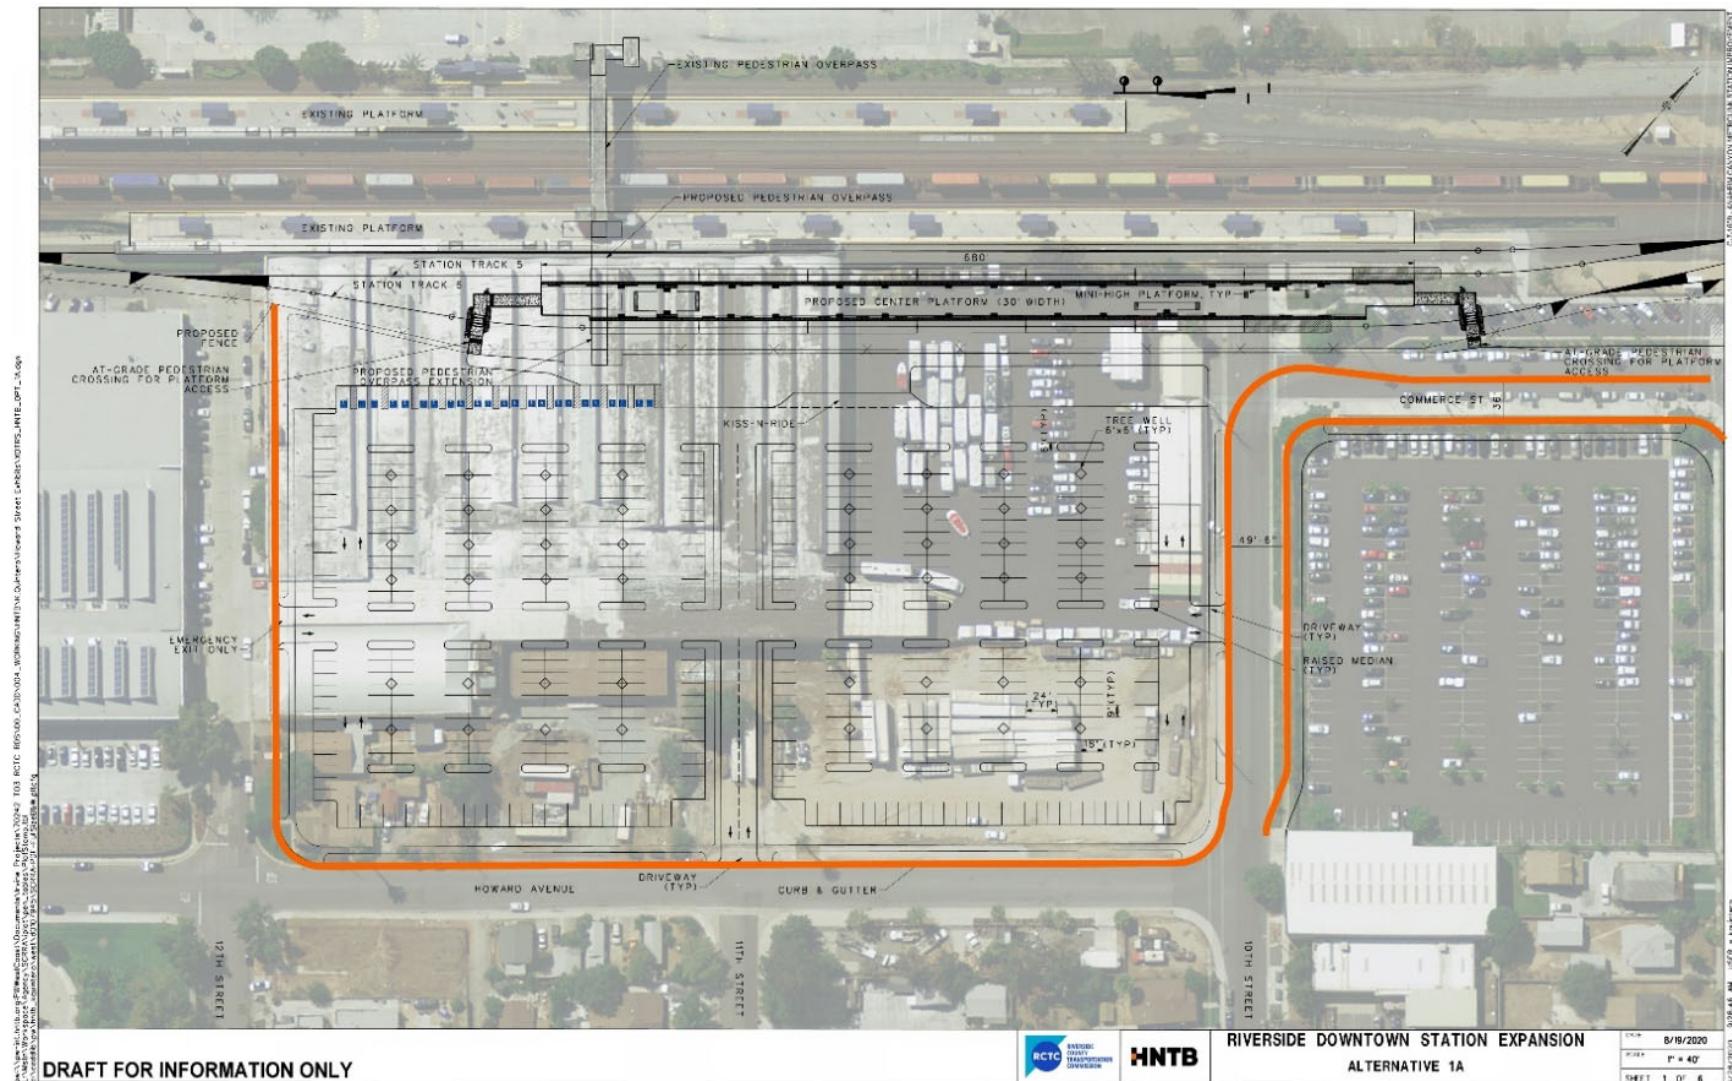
Build Alternative with Traffic Circulation and Parking Option 1A
